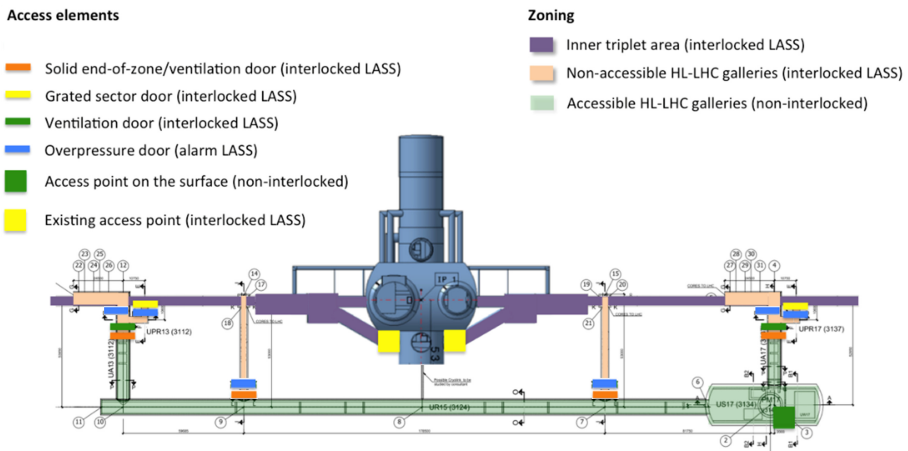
Underground access zoning and access elements at Point 1 (zoning of Point 5 is similar except for existing access point and service tunnel locations).
